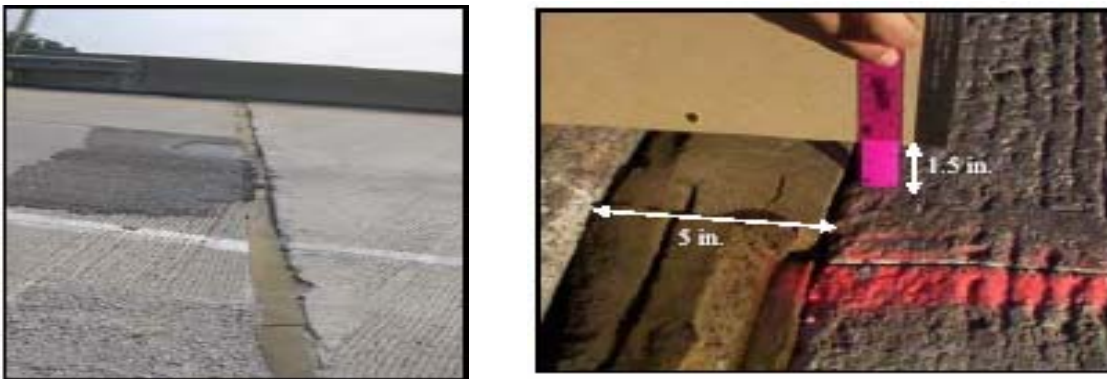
Uneven joint of approach slab an bridge deck (White et al. 2005)
